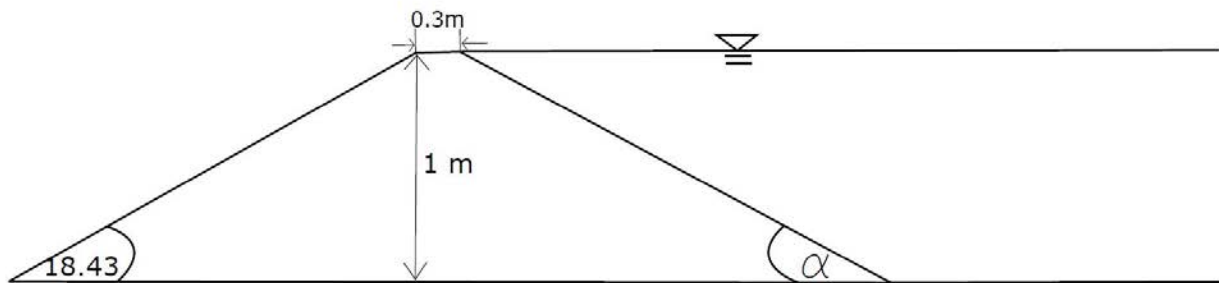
Test Series #1 – general cross-section (schematic, not to scale)
